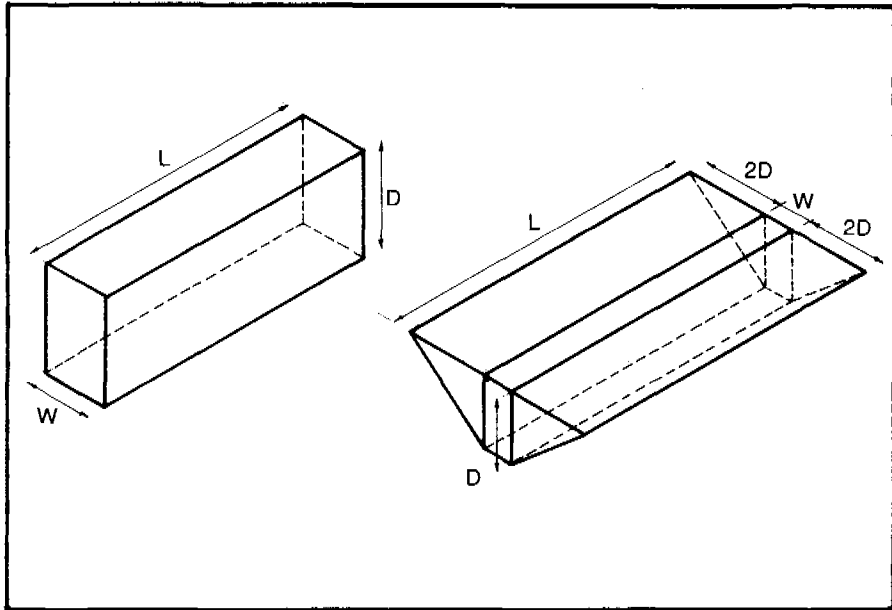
Outline design of a sub-surface clay or masonry dam
